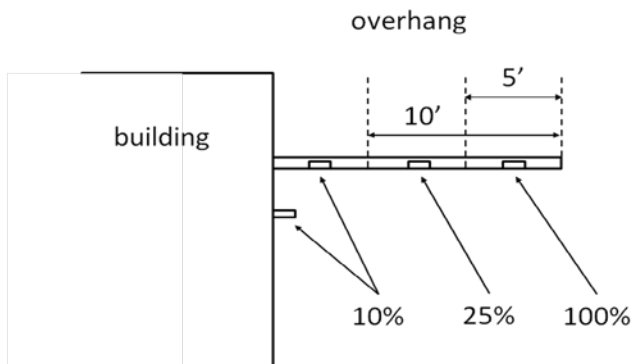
B: Elevation view of a canopy or overhang attached to a building, showing Fixture location and initial lamp output percentage counted toward Total Outdoor Light Output
